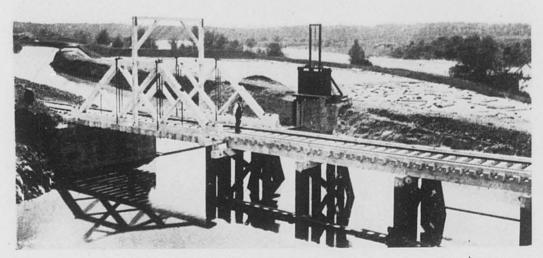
ROBBERS' RAVINE, MARKING THE DIVISION BETWEEN SECTIONS 2 AND 3 OF THE FOLSOM WATER POWER COMPANY'S CANAL, SHOWING A LOG DAM OF THE AMERICAN LAND AND LUMBER COMPANY AND THE AMERICAN RIVER IN THE BACK GROUND.
